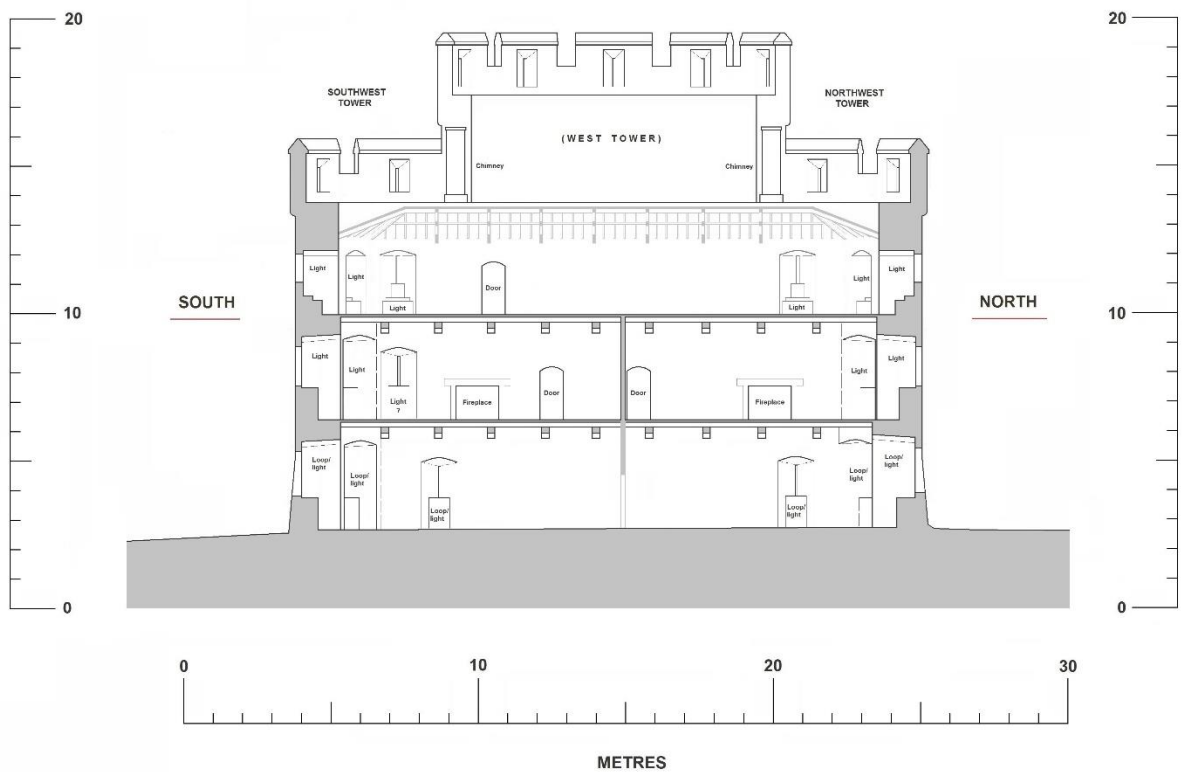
Transverse section through Picton Castle west towers, facing west – conjectured medieval
